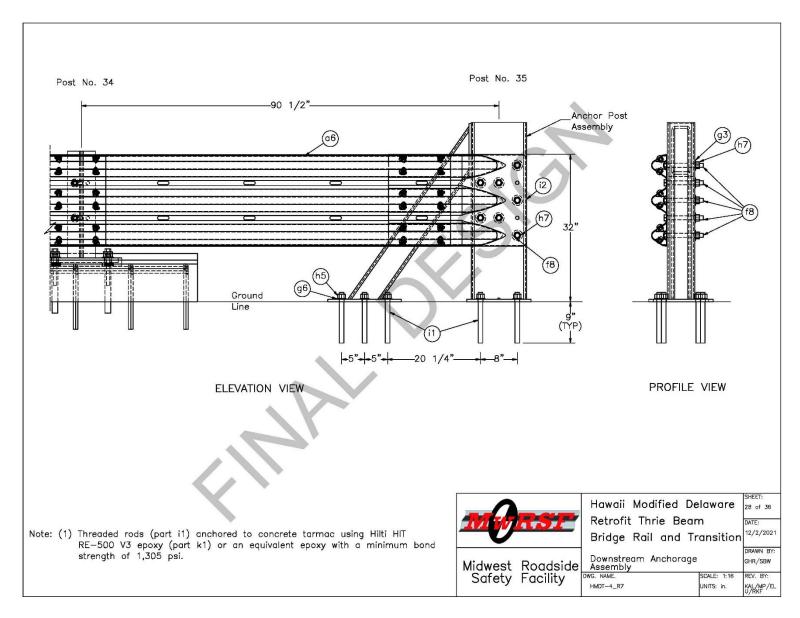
Downstream Anchorage Assembly, Test No. HMDT-4
